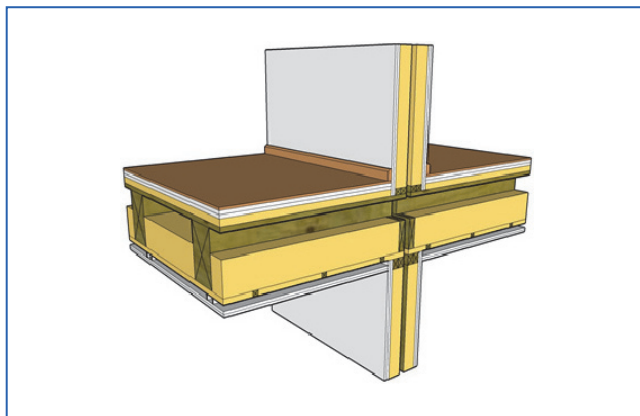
Lightweight wall structure and lightweight floating floor on wooden beams.
